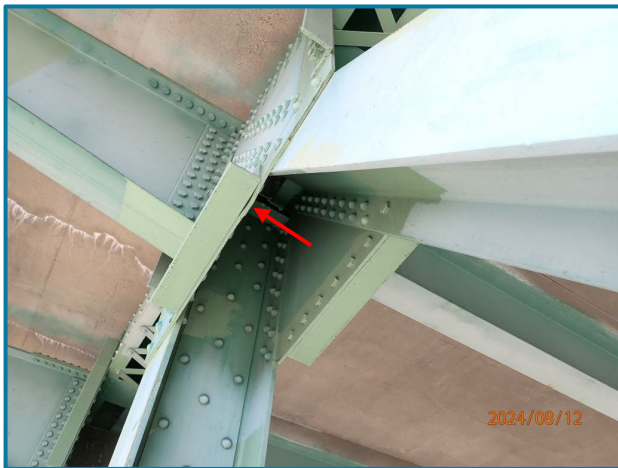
Distortion to the gusset plate at the stiffening angle (U33, South Truss, Span 9, looking up).
